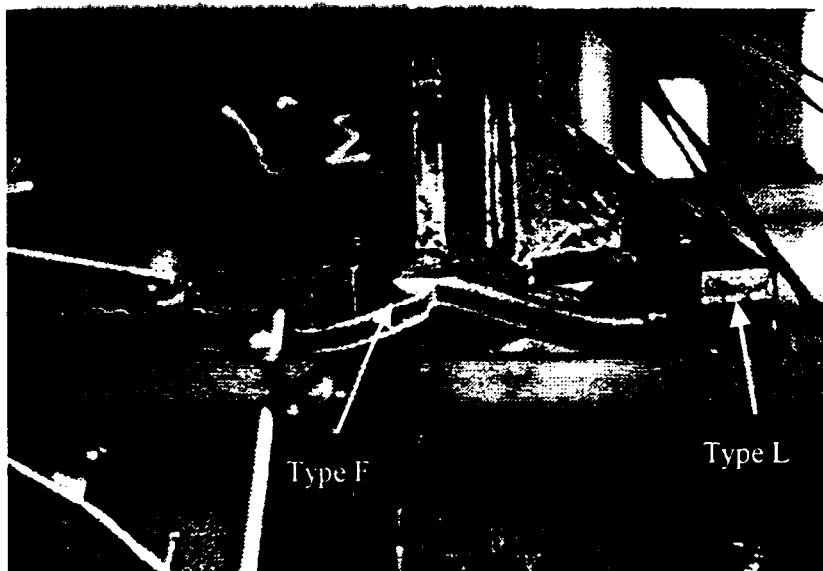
Large type F and L cracks in connection M-6 (at failure)
